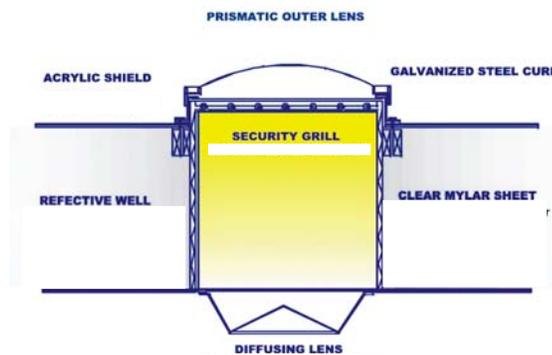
Schematic of modern skylight installation details (Source: www.daylighttechnology.com).
